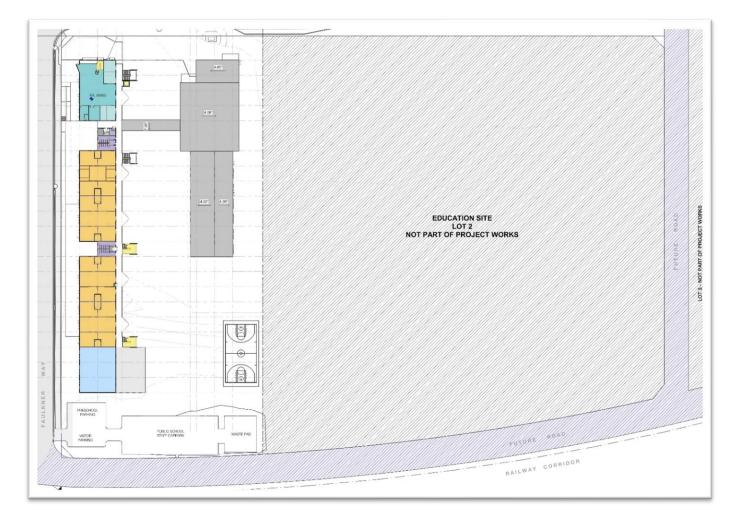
Proposed Development Layout (TKD Architects, 2021)
